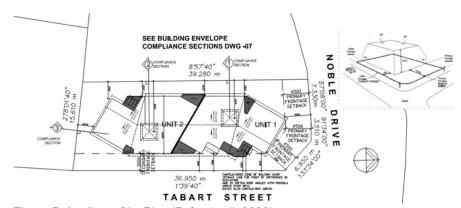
Applicant Site Plan (D Cantwell, 2020)
